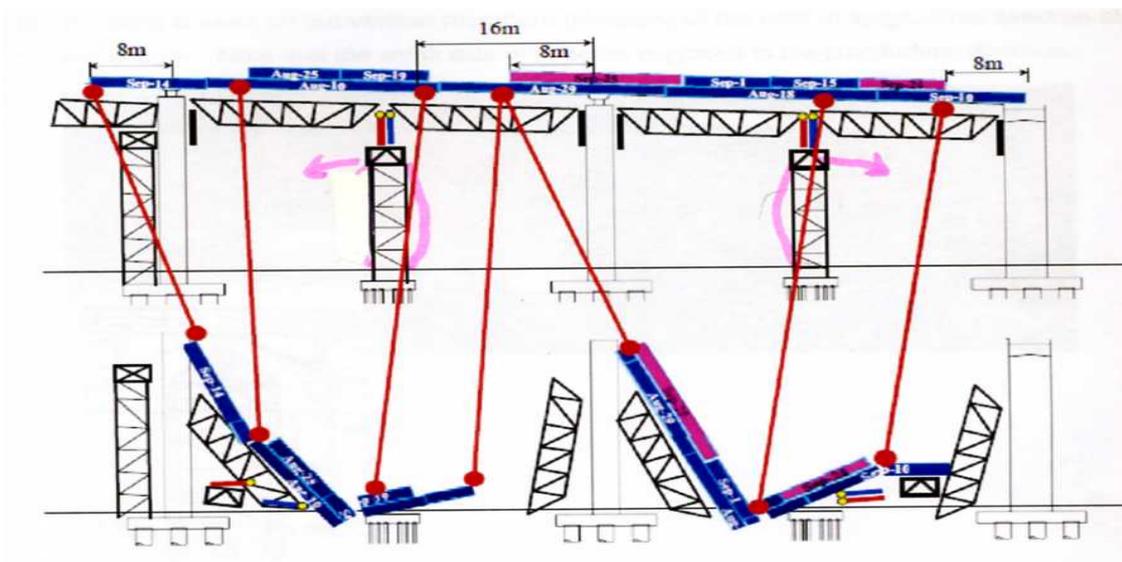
Collapsed concrete segments, scaffoldings and others (Shoi,2011)
